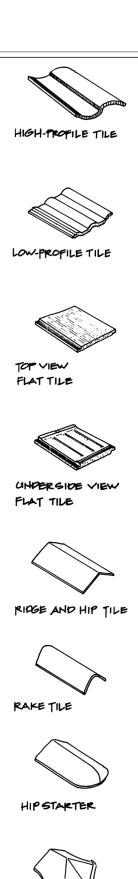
Concrete roof tiles come in a variety of shapes that range from traditional clay profiles to flat slate and shake looks. Accessory tiles make capping ridges, hips, and rakes easier, but higher profile tiles still require mortar or a substitute to keep weather out.
